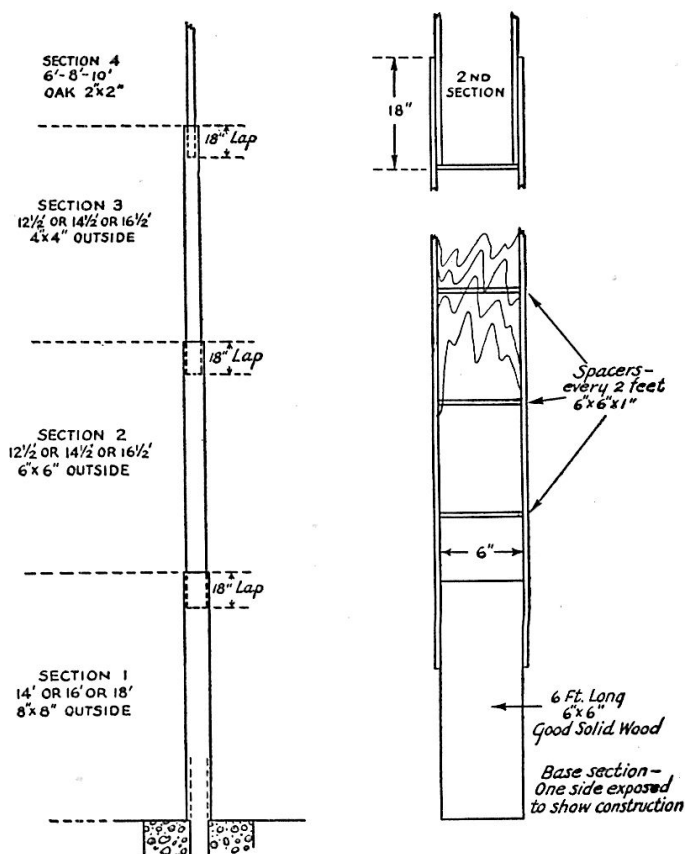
A hollow mast, light weight but strong, constructed of 1-inch boards.
